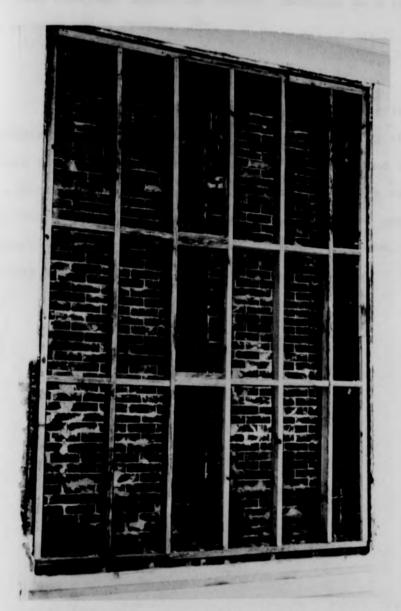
South Central Bedroom on East Wall with Double Window Closed Off
